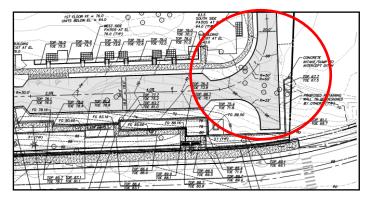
Detail of Sidewalk at Northwest Façade of Building
